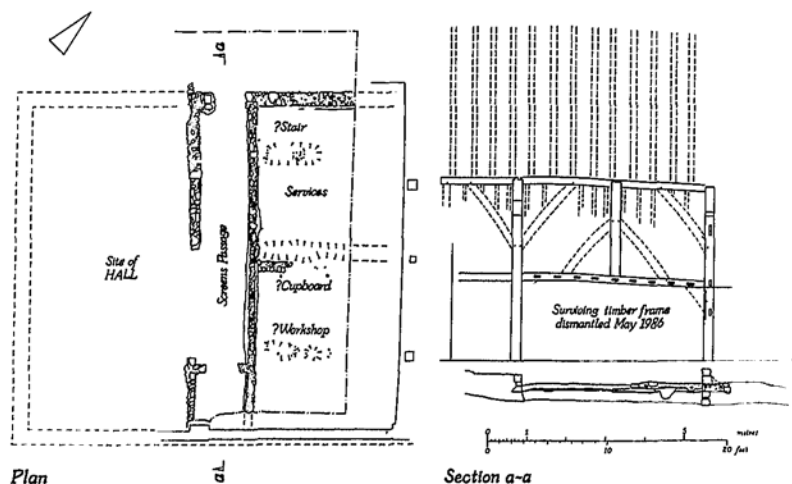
No. 36 Stour Street: Plan of fifteenth-century Building and Elevation of contemporary Timber Frame: (Scale: 1:200).
